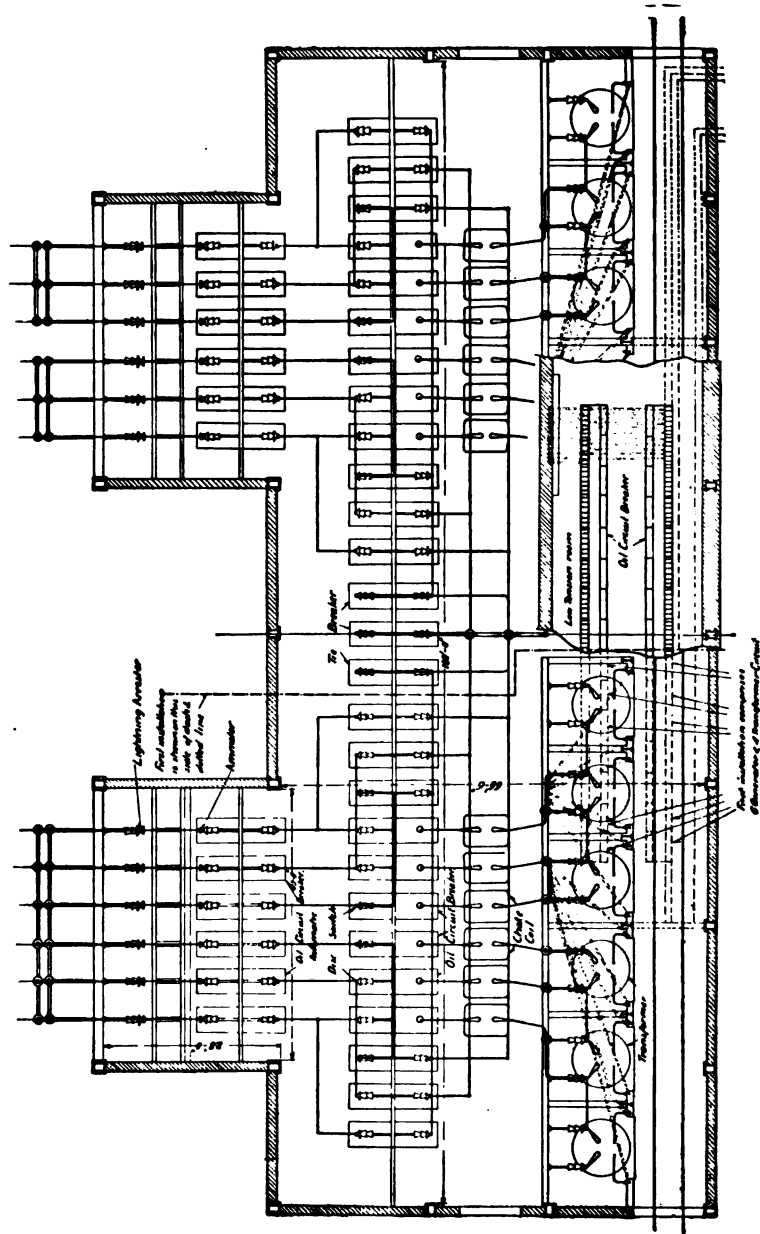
Plan of transformer and switching house, 100,000-volt plant
